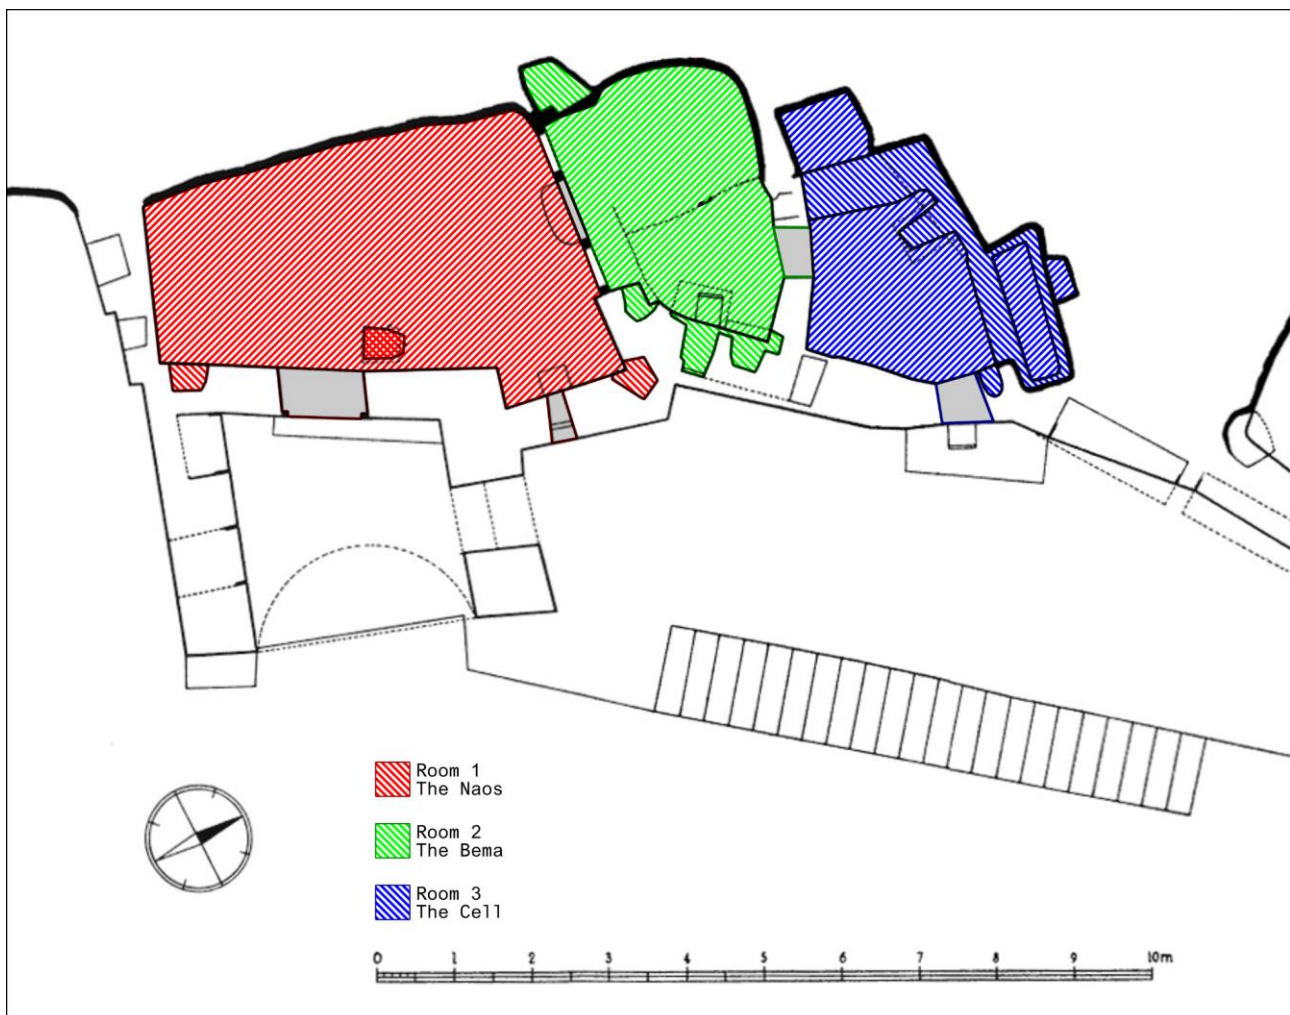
Floor plan of the Enkleistra showing the layout of the three cave rooms, adapted from Mango, C., and Hawkins, E.¹¹
